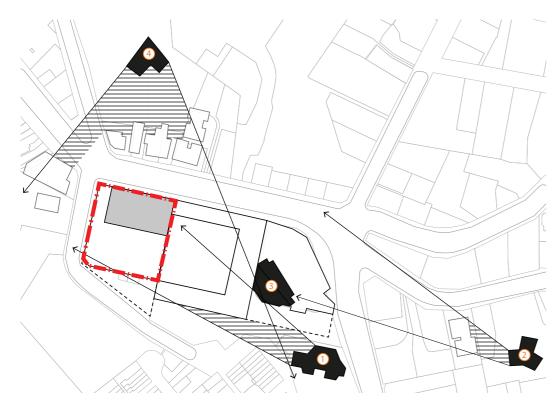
Views (across subject site) available to neighbouring towers - Ground Floor Level.
